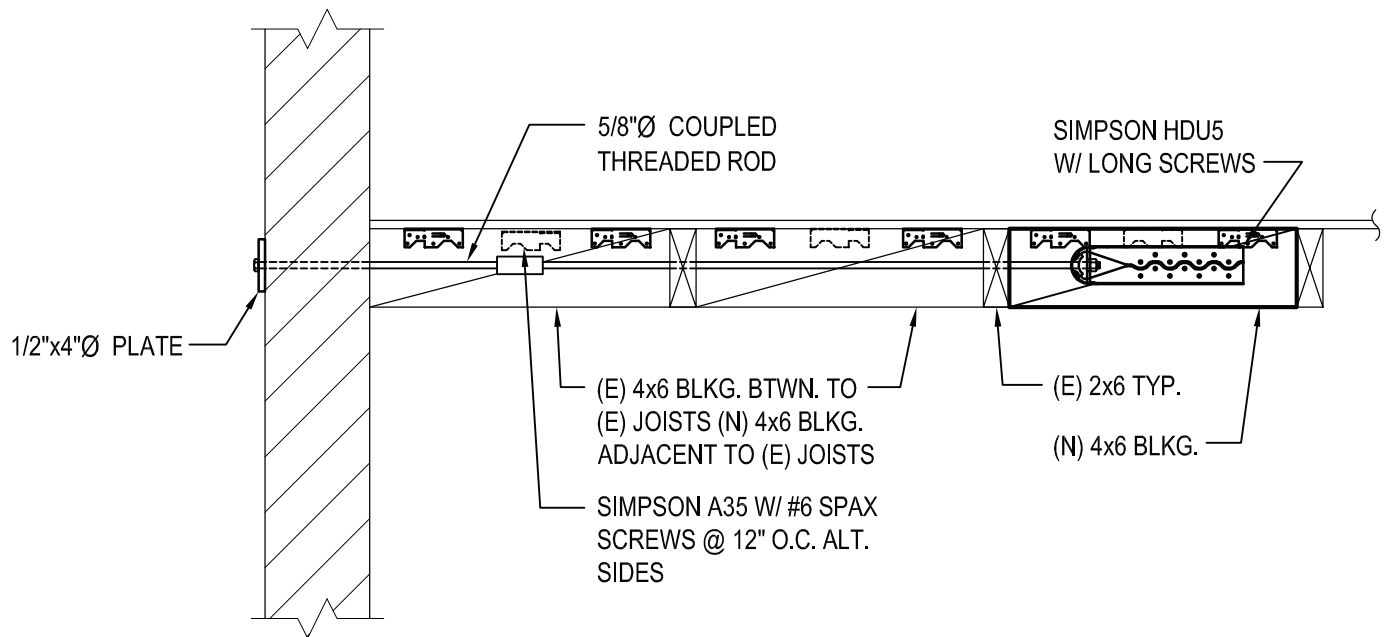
Long Wall Anchorage, Parallel to Joists
